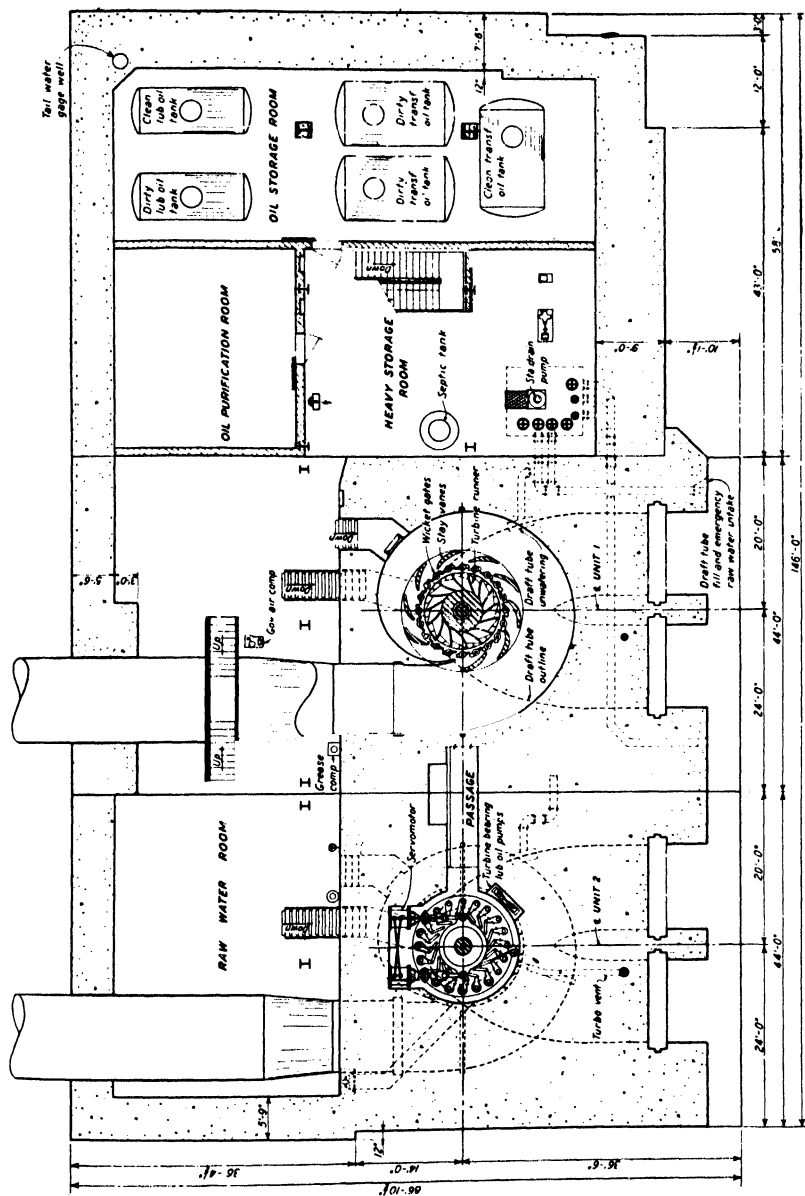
Sectional plan, powerhouse, Apalachia project.
